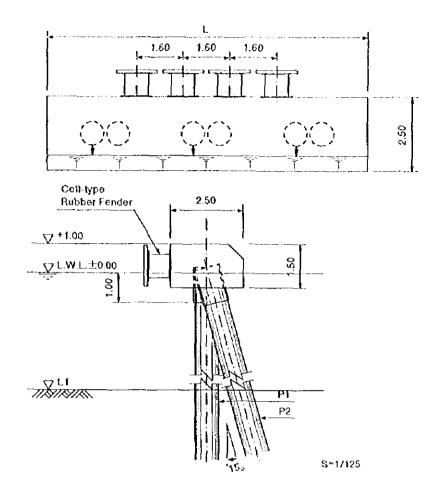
Typical Cross Section of Mooring Dolphin
